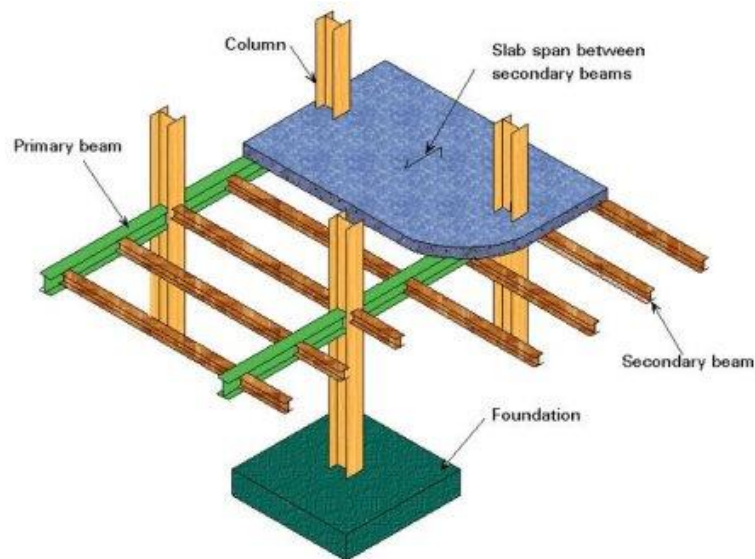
Arrangement of primary beam, secondary beam and columns (Source: www.petervaldivia.com)
